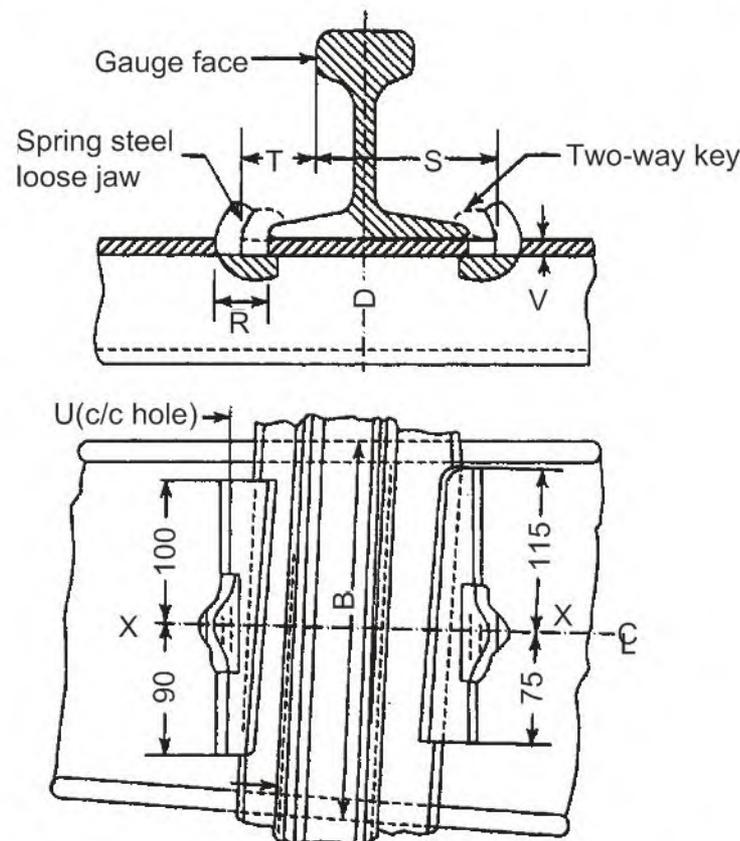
BG and MG steel trough sleepers (plan at rail seat)
